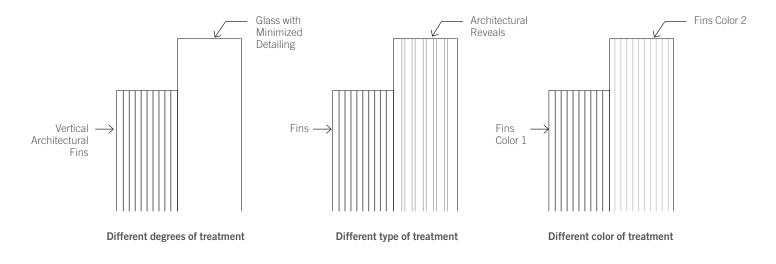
H1 Façade Articulation: Treatment Examples
